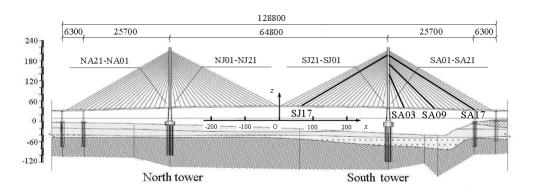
The investigated cable-stayed bridge (unit: mm).
